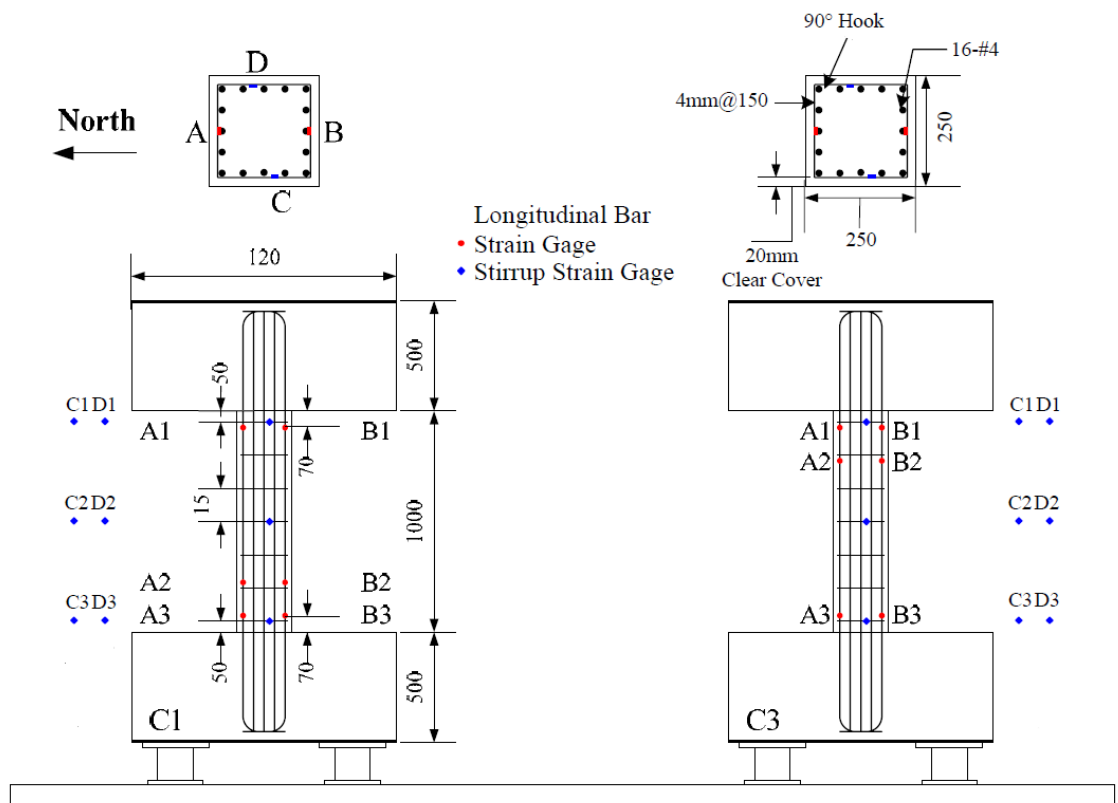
Shaking table test T4 specimen design layout (Su 2007)
